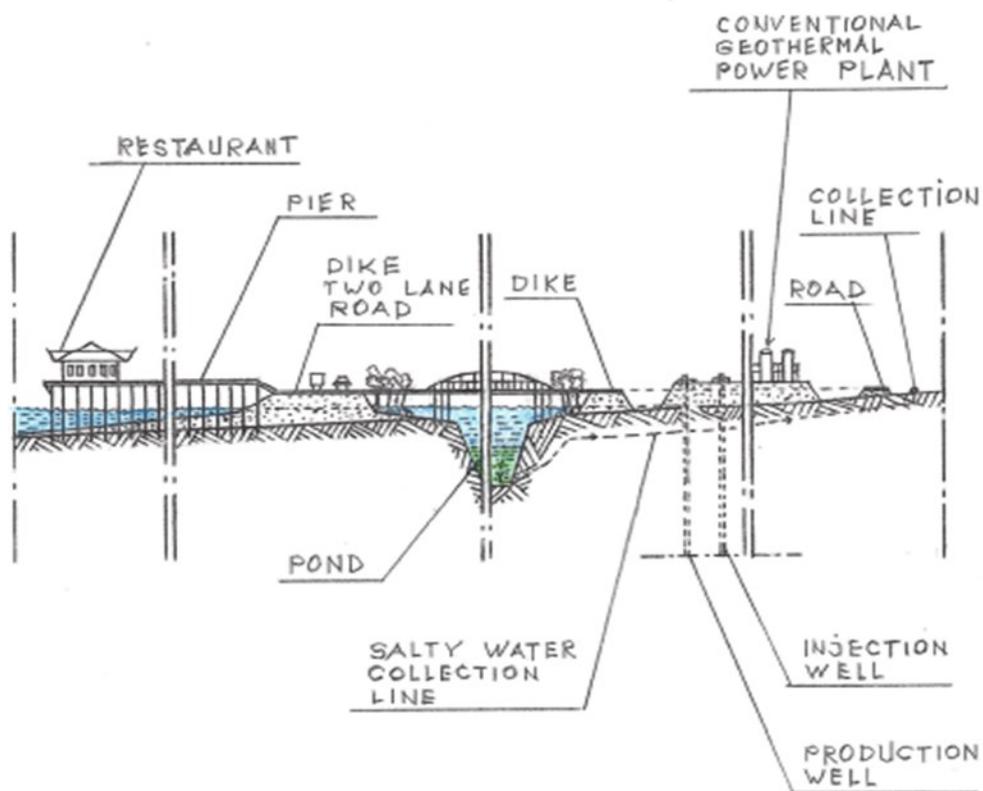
Cross-sectional view taken near a typical dike-pier intersection
